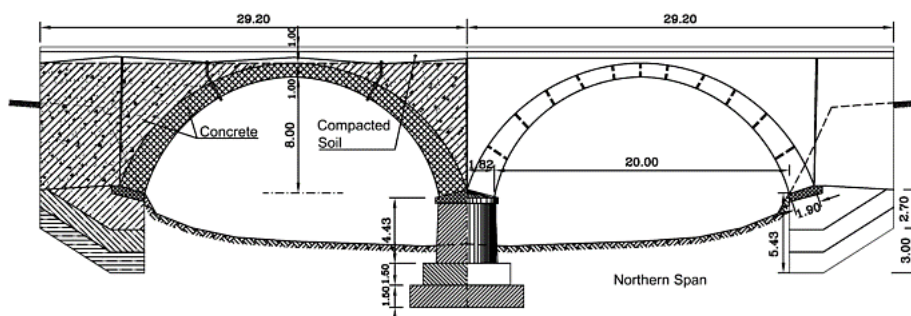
Bridge Km-23, Tehran-Qom Railway (Marefat, et al., 2004)
